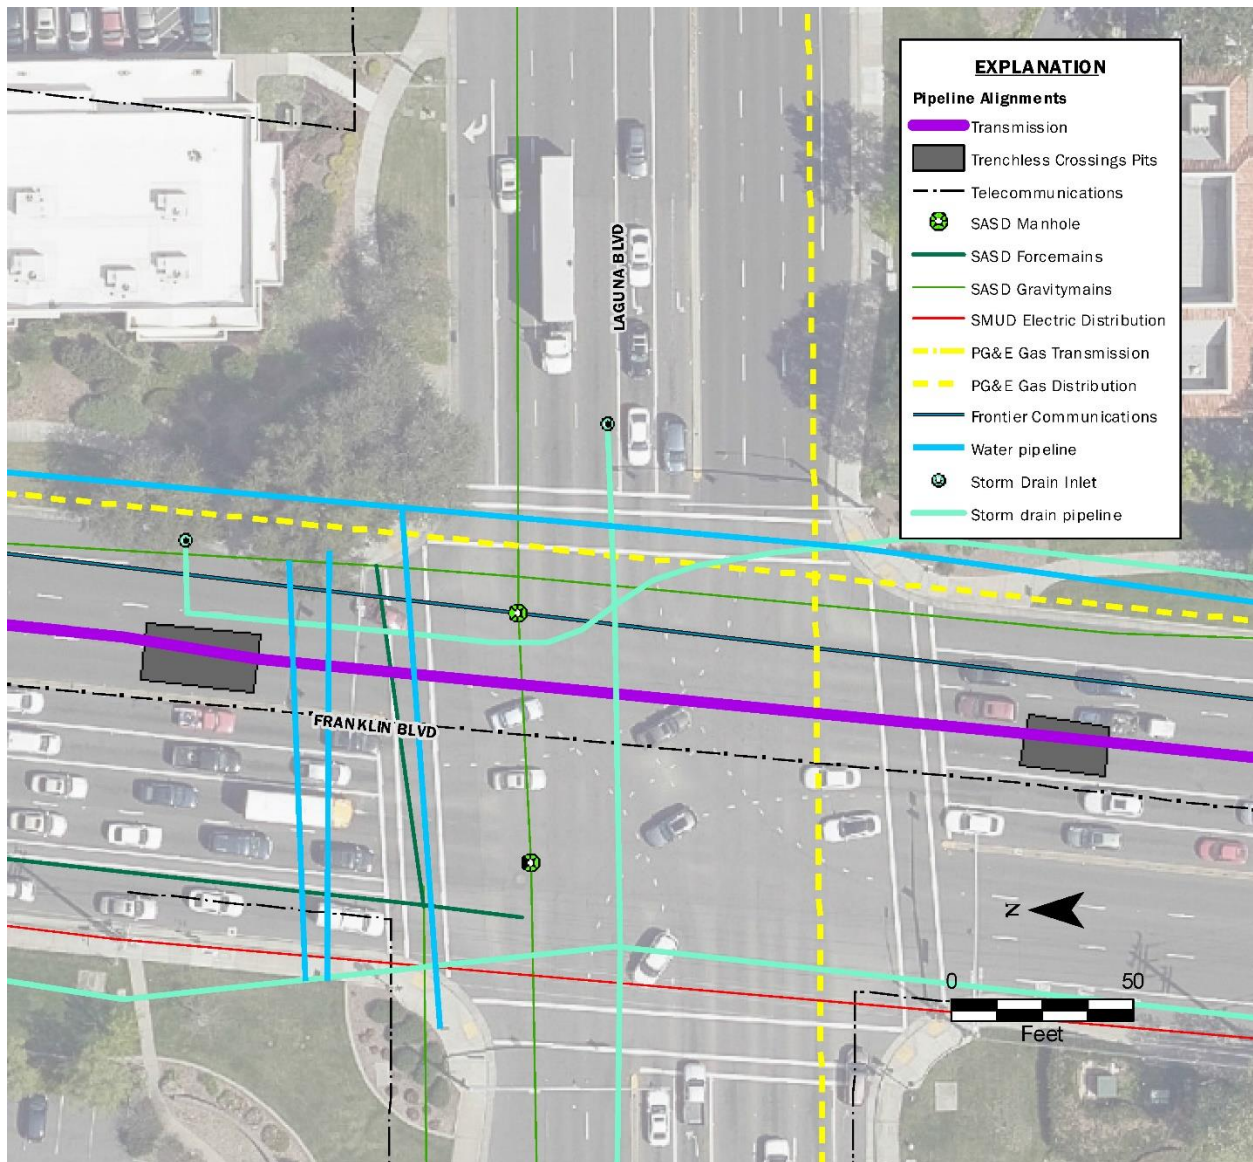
Proposed Trenchless Crossing of Laguna Boulevard at Franklin Boulevard
